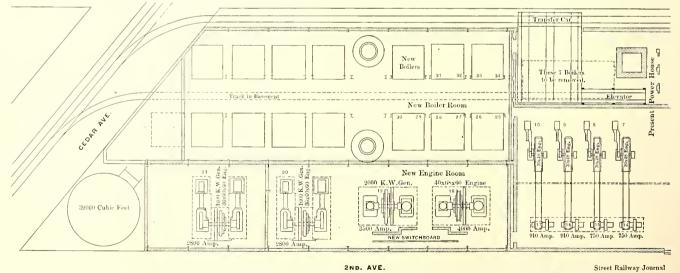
FIG. I.-IMPROVEMENTS IN CLEVELAND POWER HOUSE-GROUND PLAN OF PLANT WITH EXTENSIONS
